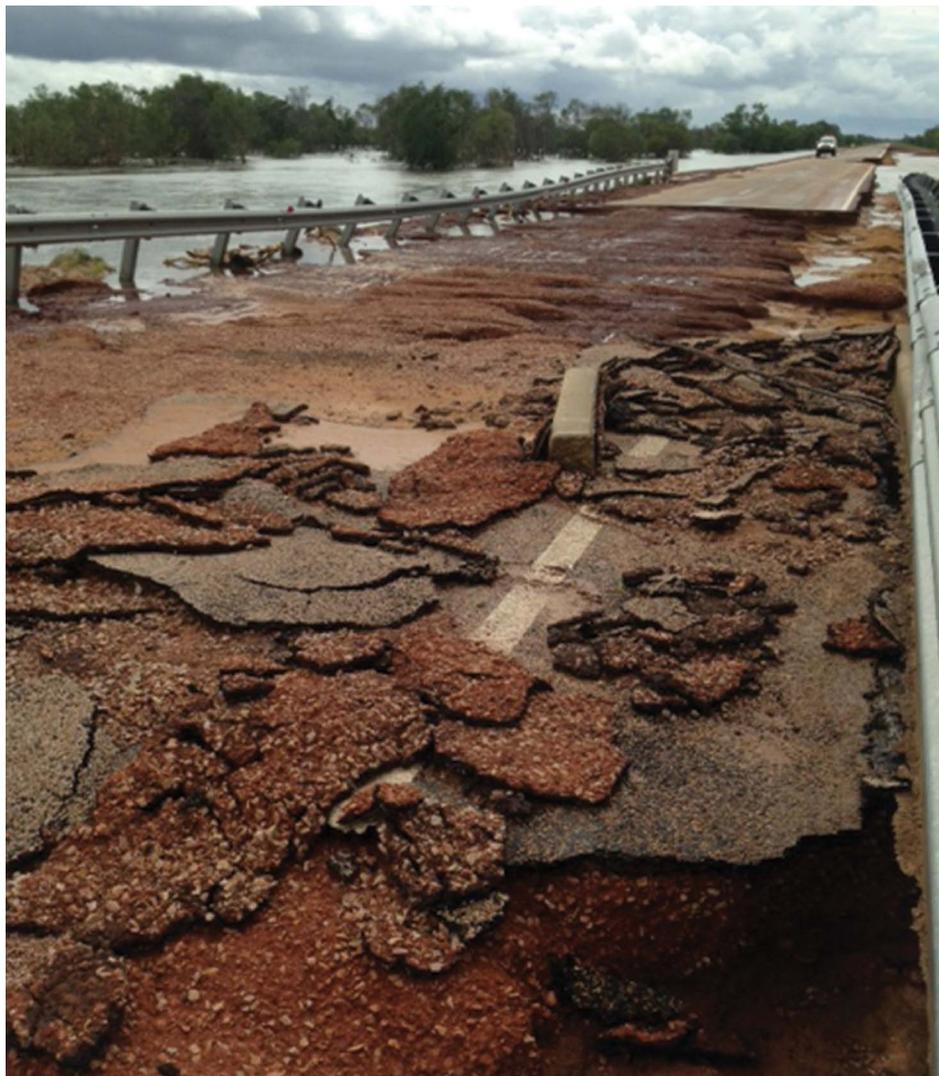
Flood damage to the Logue River bridge in the Kimberley.
